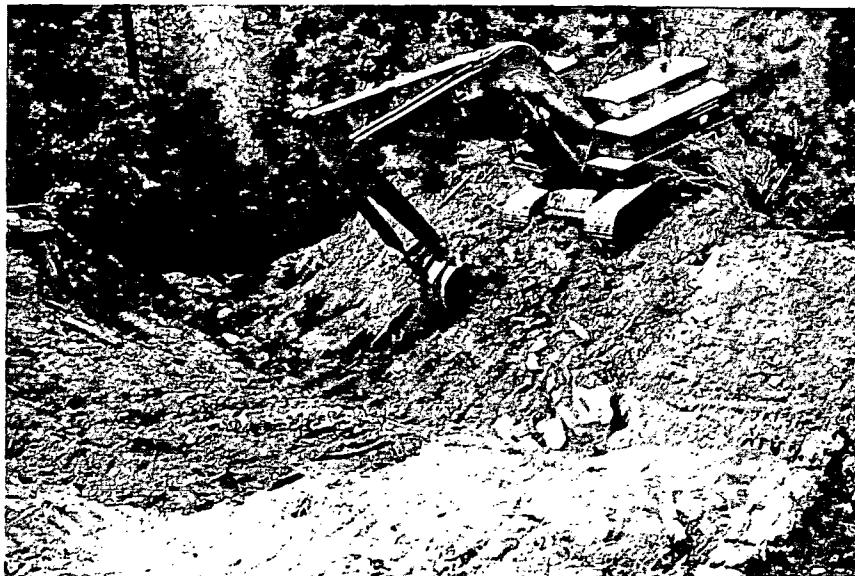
(above left). Typical stream crossing being excavated by hydraulic excavator.
